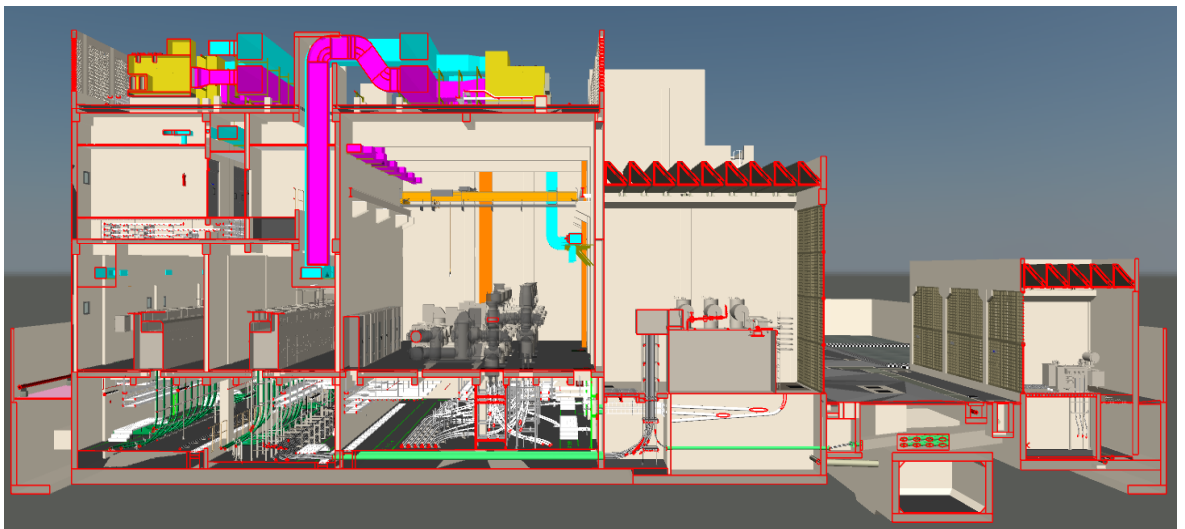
Cross sectional elevation for 132/11 Kv substation (pilot project)
